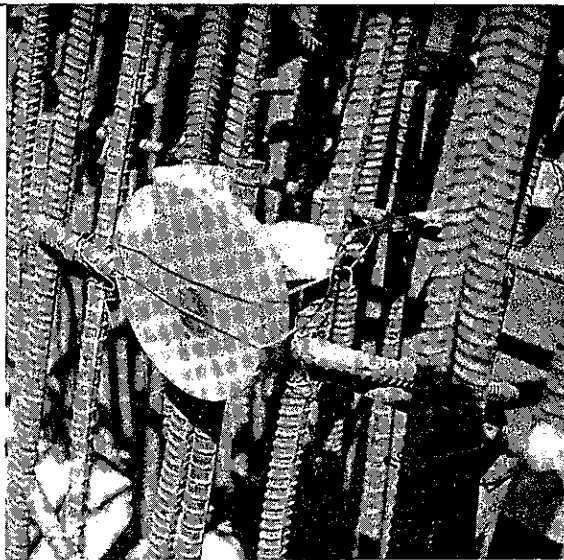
Close-up view of wooden blank fastened to reinforcing steel.
